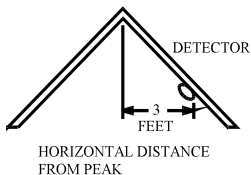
Recommended installation location for smoke & heat detectors in rooms with sloped ceilings or gables (slope >20 degrees).
